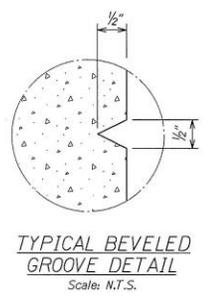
HDOT AGT to 34-in. Tall Bridge Rail Details, Continued
